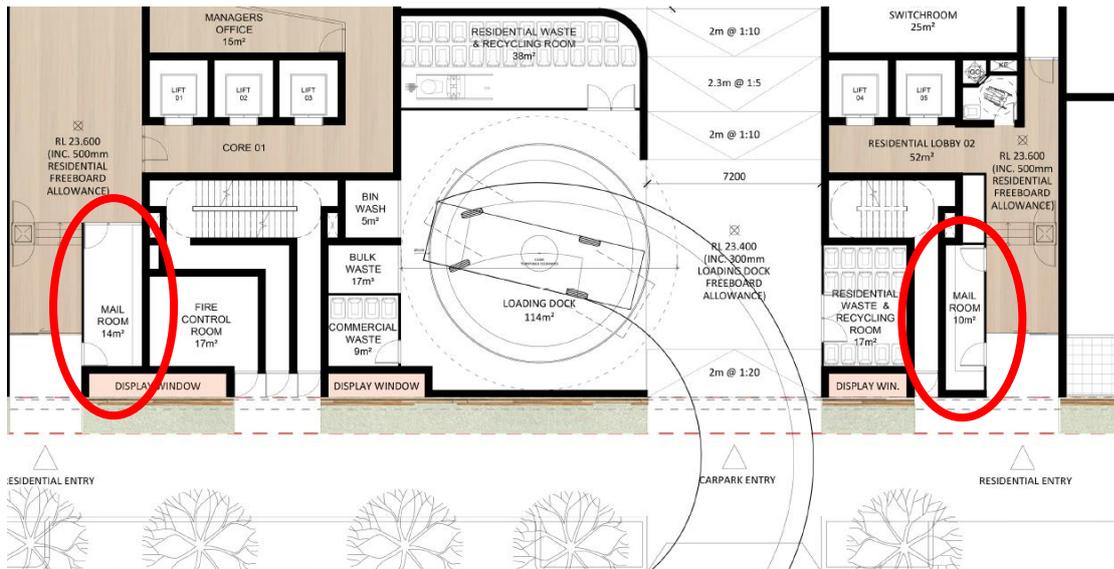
The amended indicative ground floor plan presented to the competitive design process selection panel, with the location of the mail rooms and their impact on the lobby entrances highlighted
